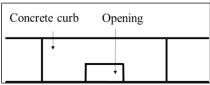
Concrete Curb Inlet (Adapted from Department of Irrigation and Drainage (DID), 2012).
